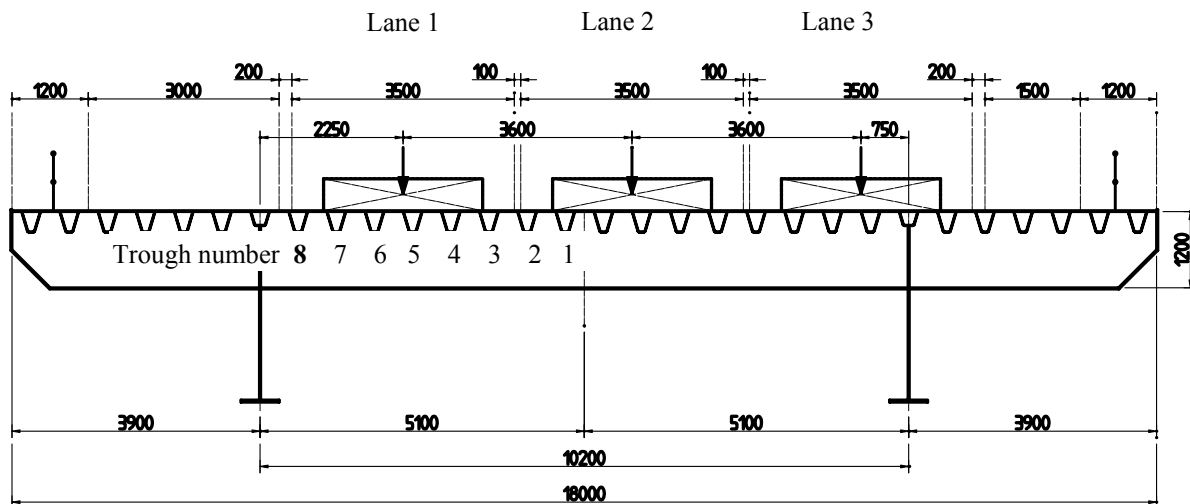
Cross section of bridge deck with crossbeam in elevation
